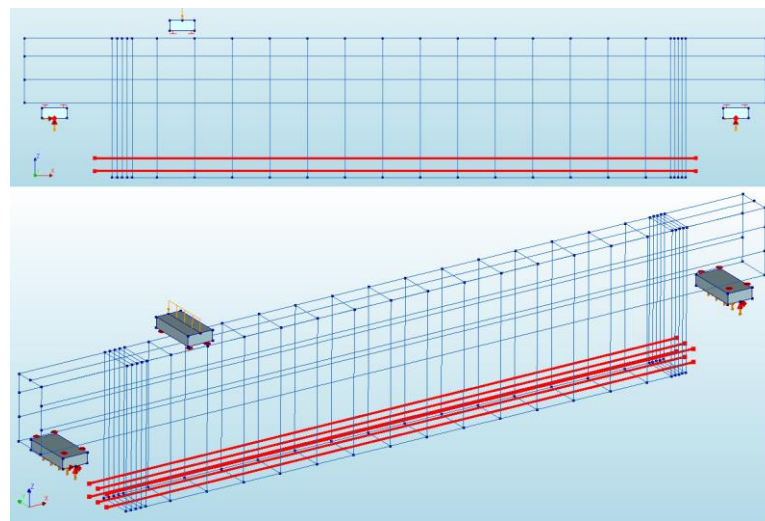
Prestressed reinforcement in the numerical model of the beam.
